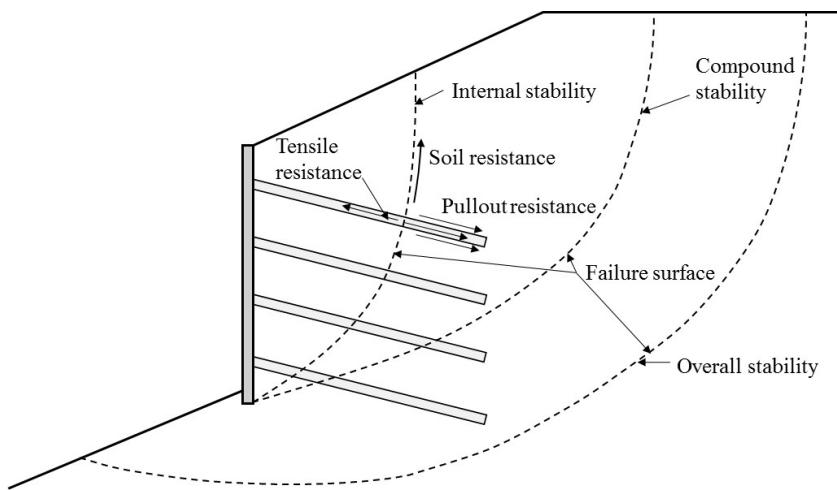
Failure Modes in Soil Nail Walls
